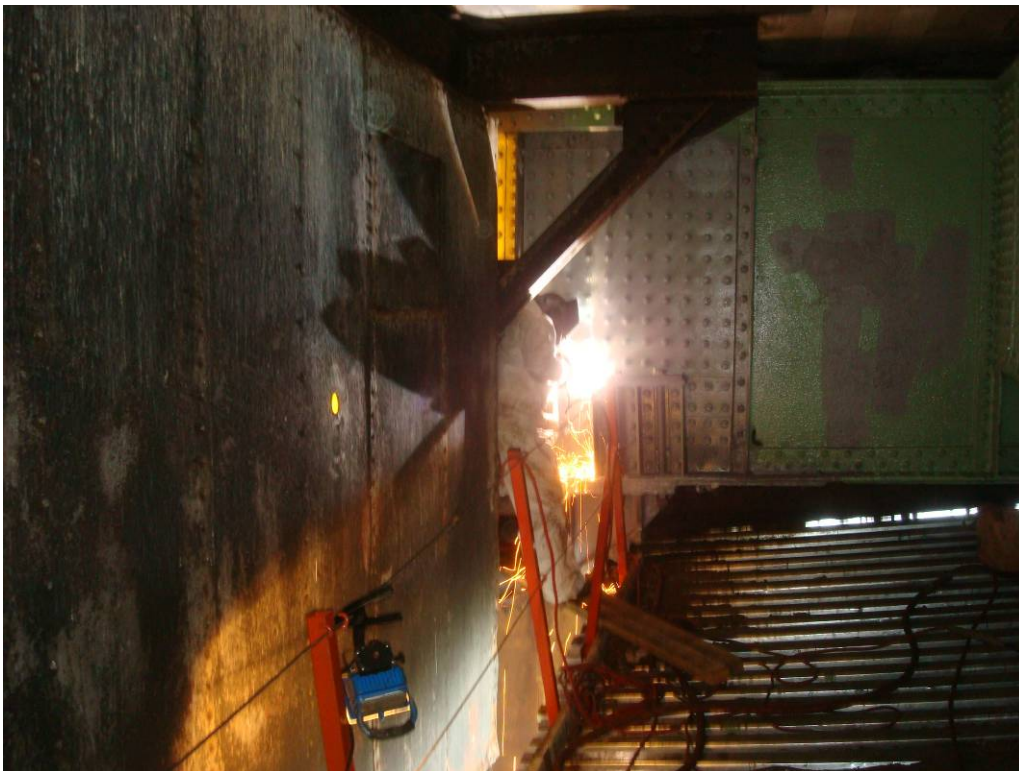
The East face of the West girder rack stiffener. The upper cap plate is being field welded to the rack plate in progress.
